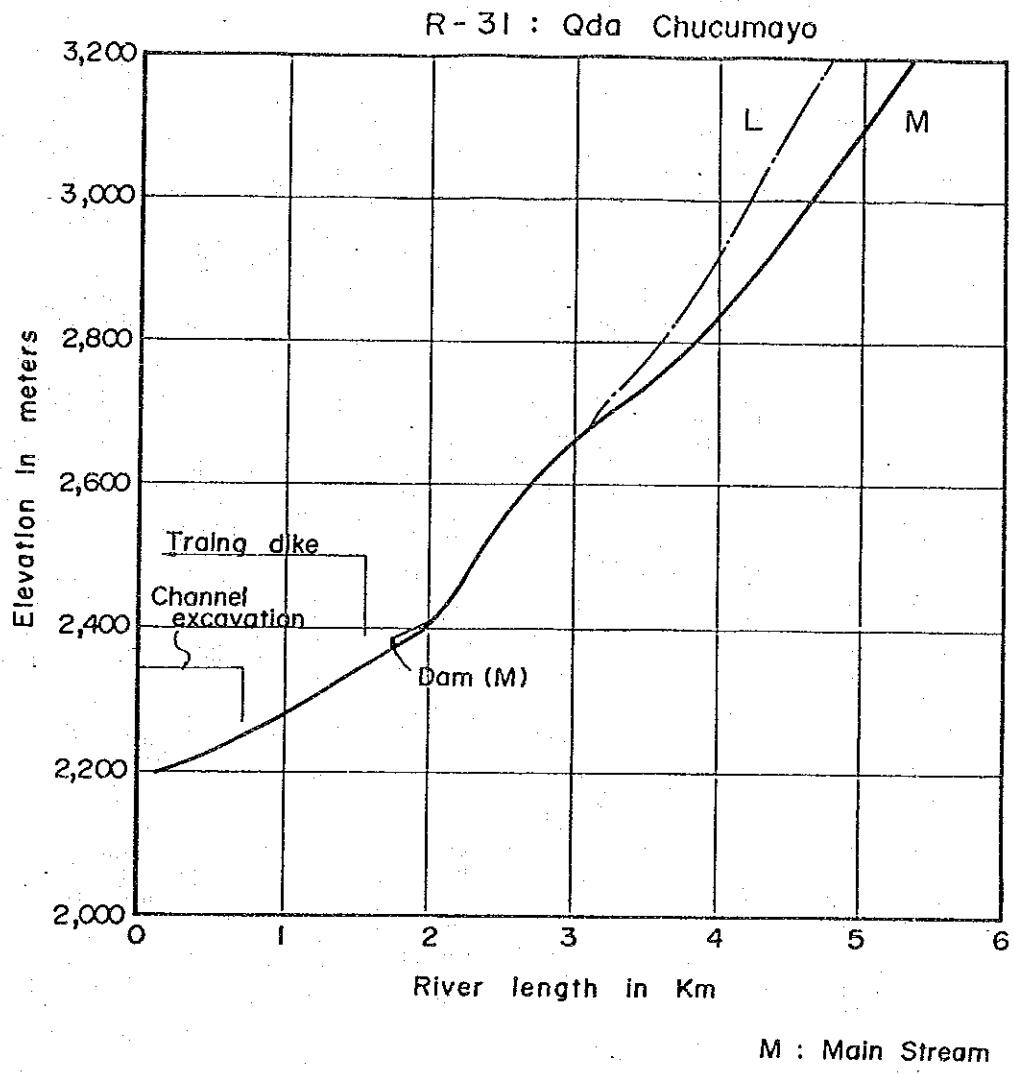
Structural Plan on Profile of Qda Chucumayo (R31)
